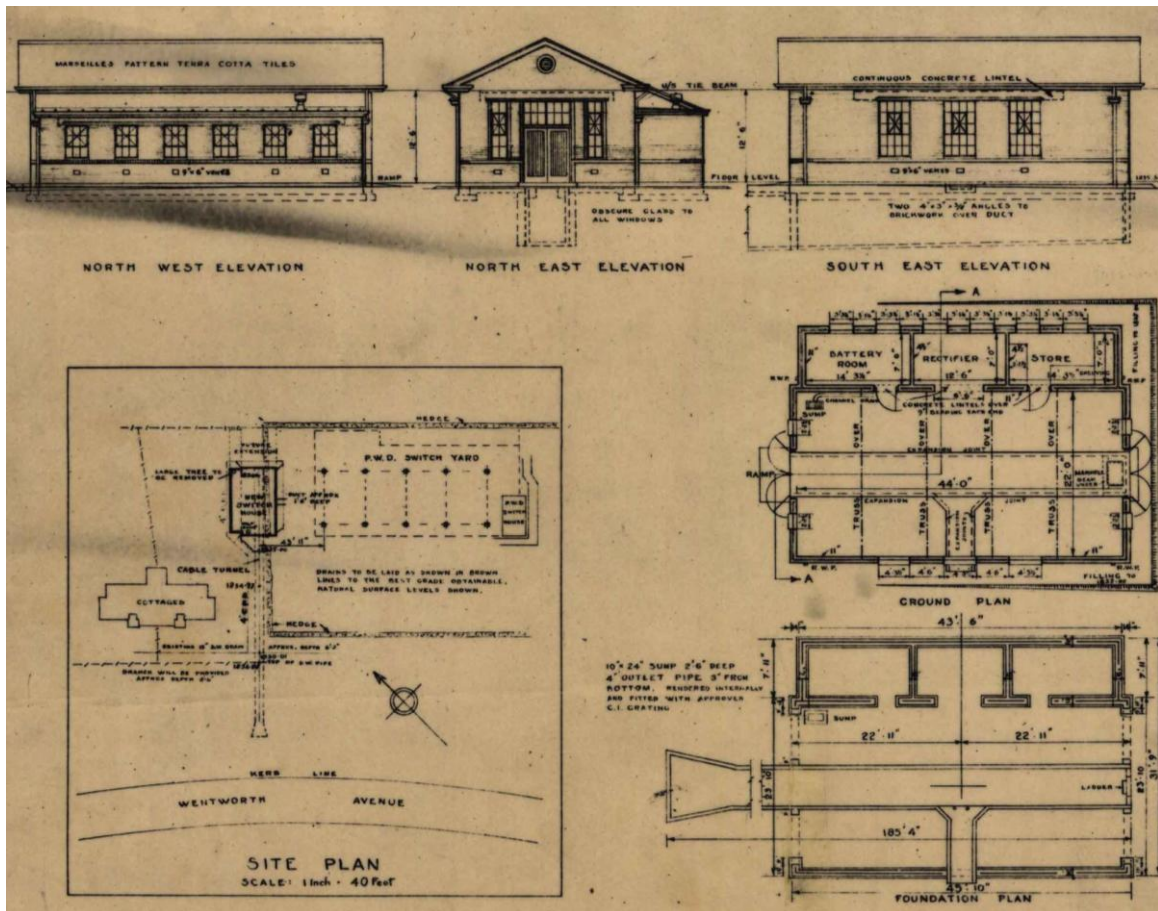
Elevations and plans for the New Switch House at the Electricity Supply Power Station, Kingston, 11 August 1947.
